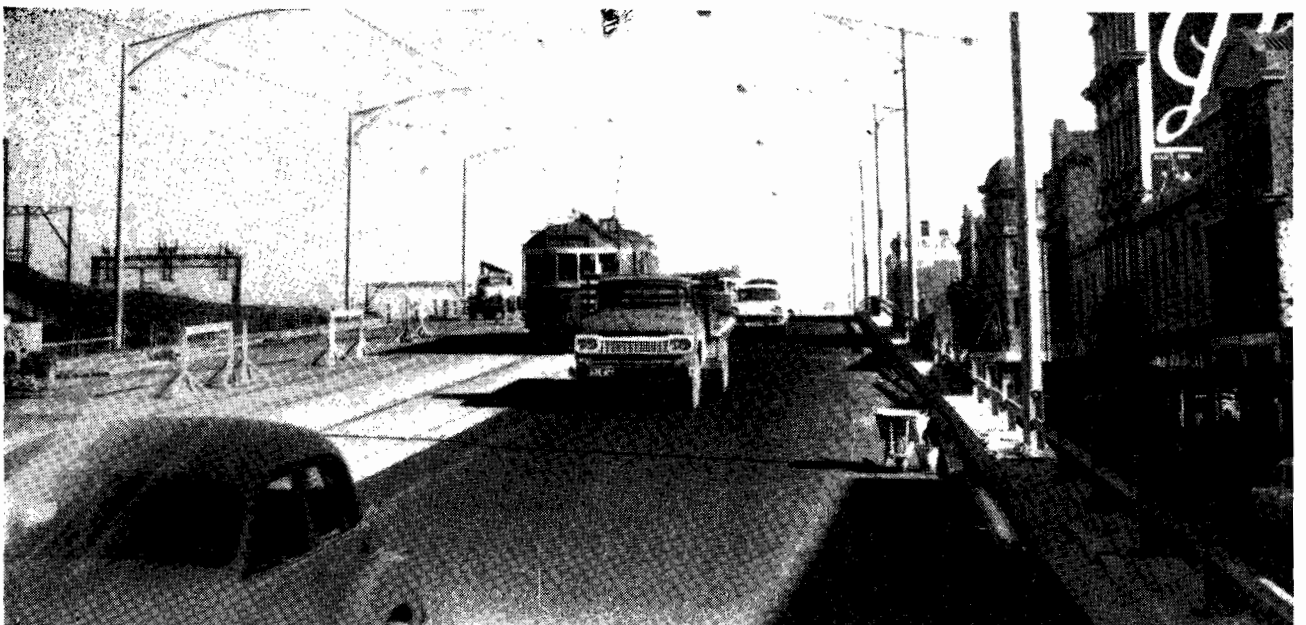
King Street Bridge. City of Melbourne. Showing traffic using half of overpass in Flinders Street, late July, 1960.
